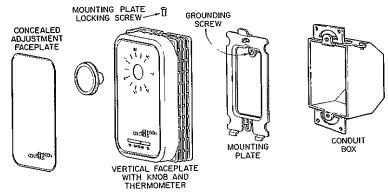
Line drawing illustrating method of mounting a vertical thermostat to outlet box. Also shown is a solid vertical faceplate for concealed adjustment when desired.
